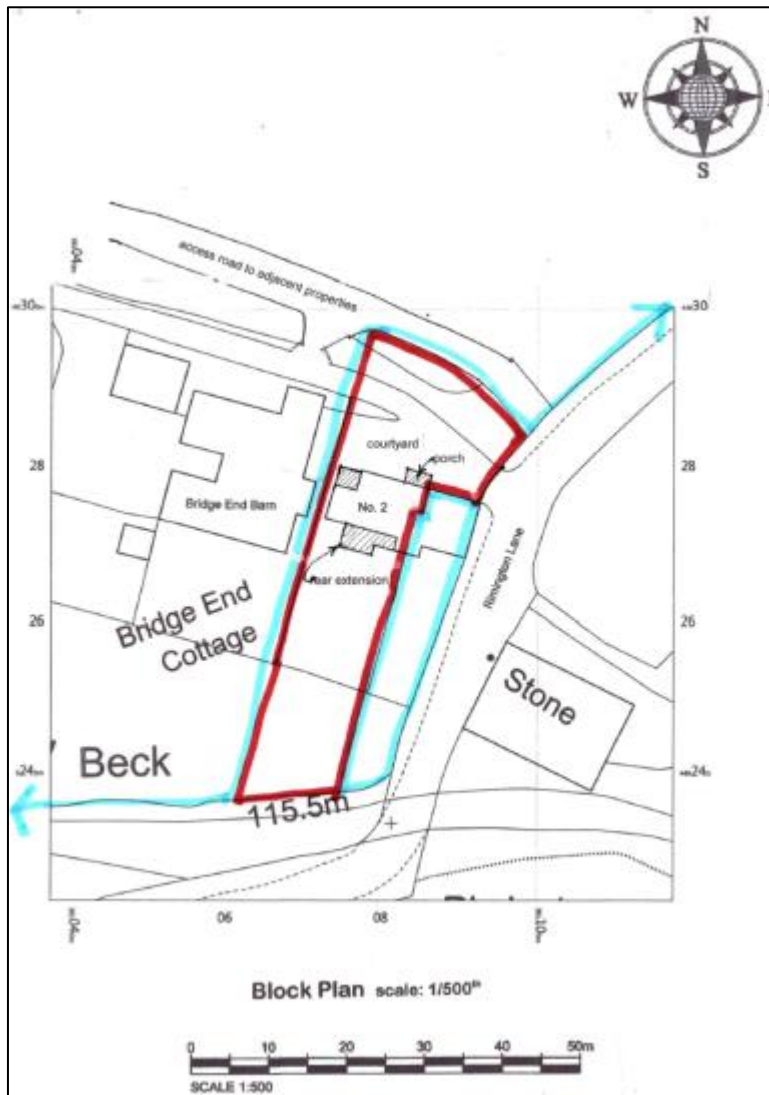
Location plan with proposed extensions (©David Liversidge design, 2021)
